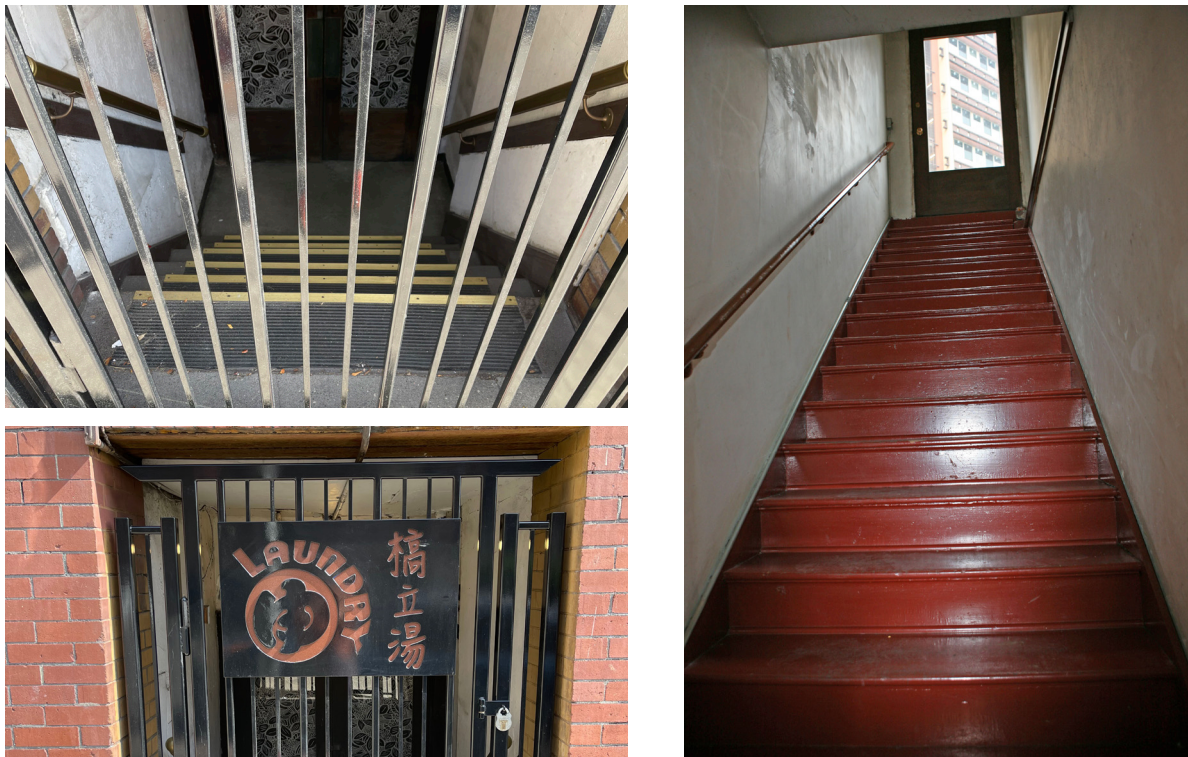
302 Sixth Avenue S entrance stair and sign (left) and the 609-1/2 S Main entrance stair (right).
